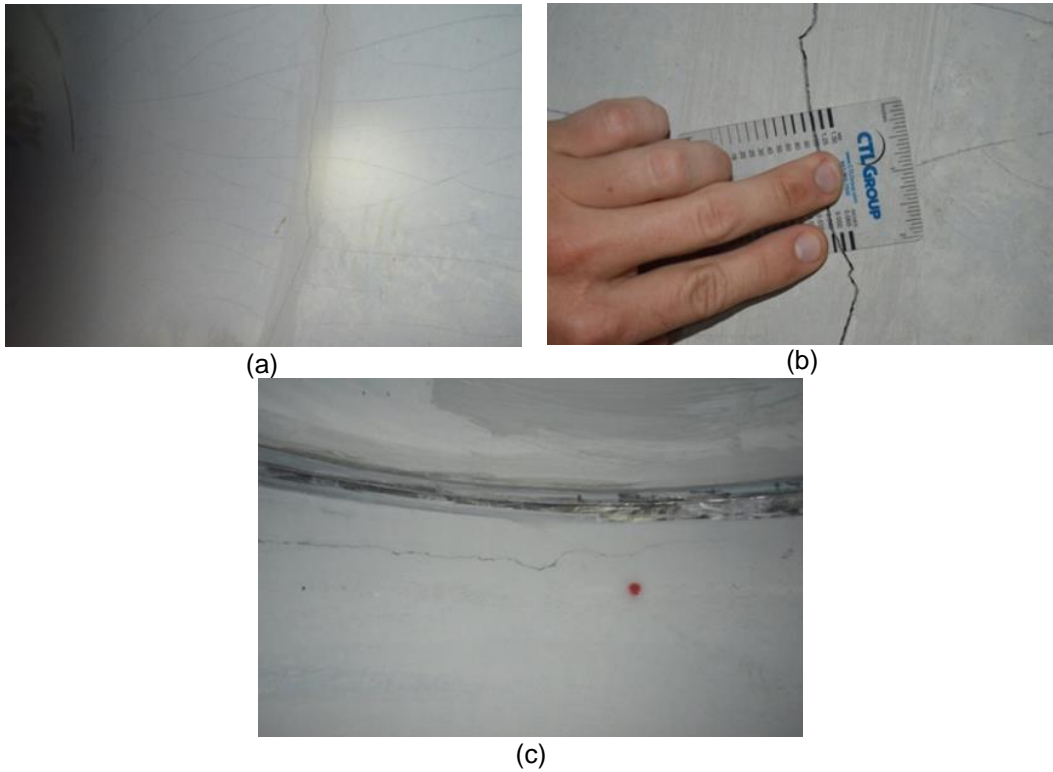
Types of cracks observed in pipe out-section (a) Small longitudinal cracks (b) 1 inch crack (c) Circumferential crack
